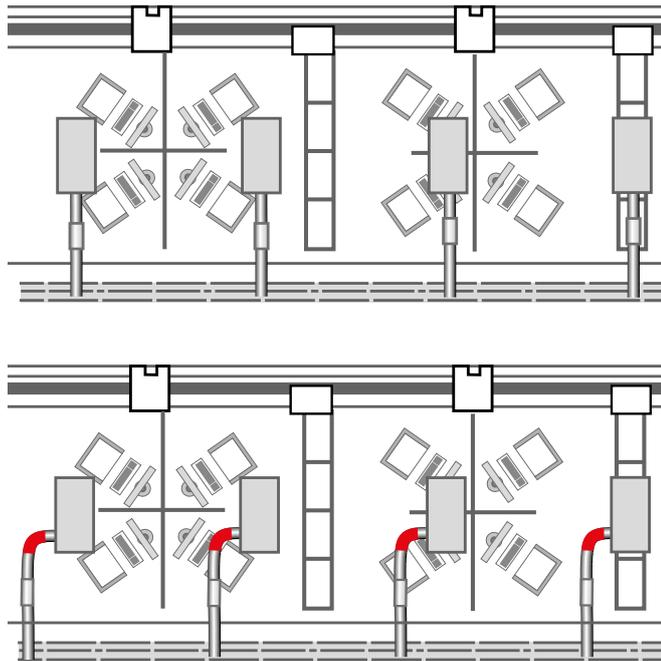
Installation example. Straight air connection, alternative with 90° bend.
